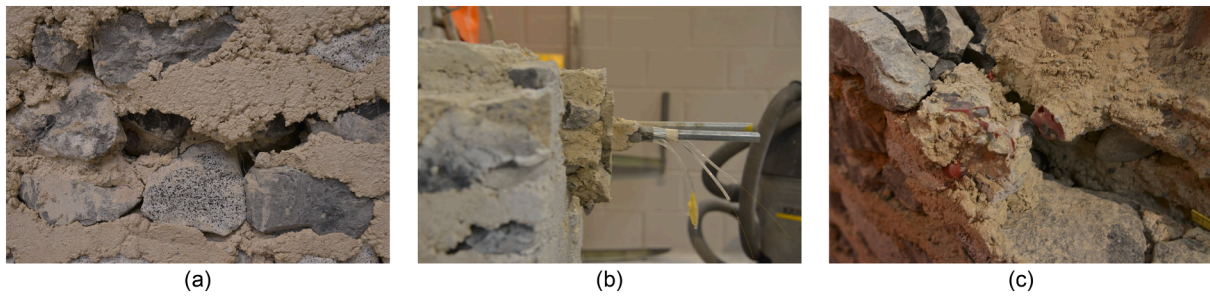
Damage observed for PAT specimens during demolition: (a) damage at the back of the wall (PAT1); (b) breakout failure (PAT3); (c) damage observed for the anchors (PAT4).
